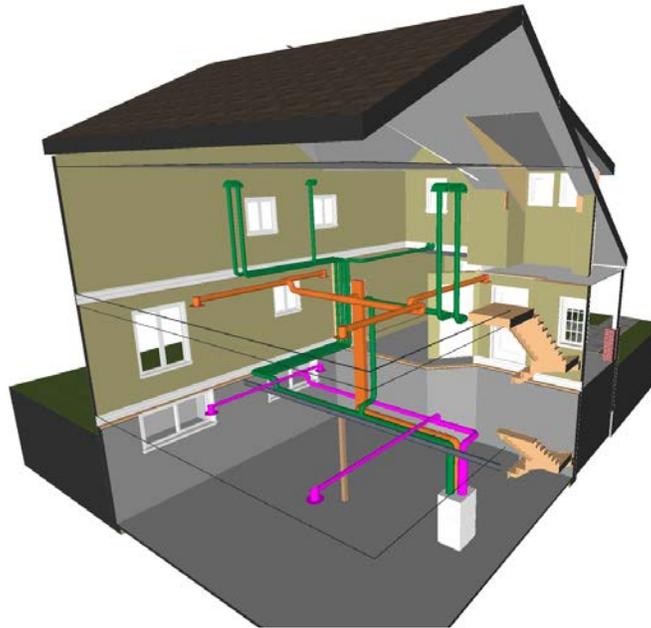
Floor-by-floor Zoned Ducting using OPTION B: Central Supply Ducts
